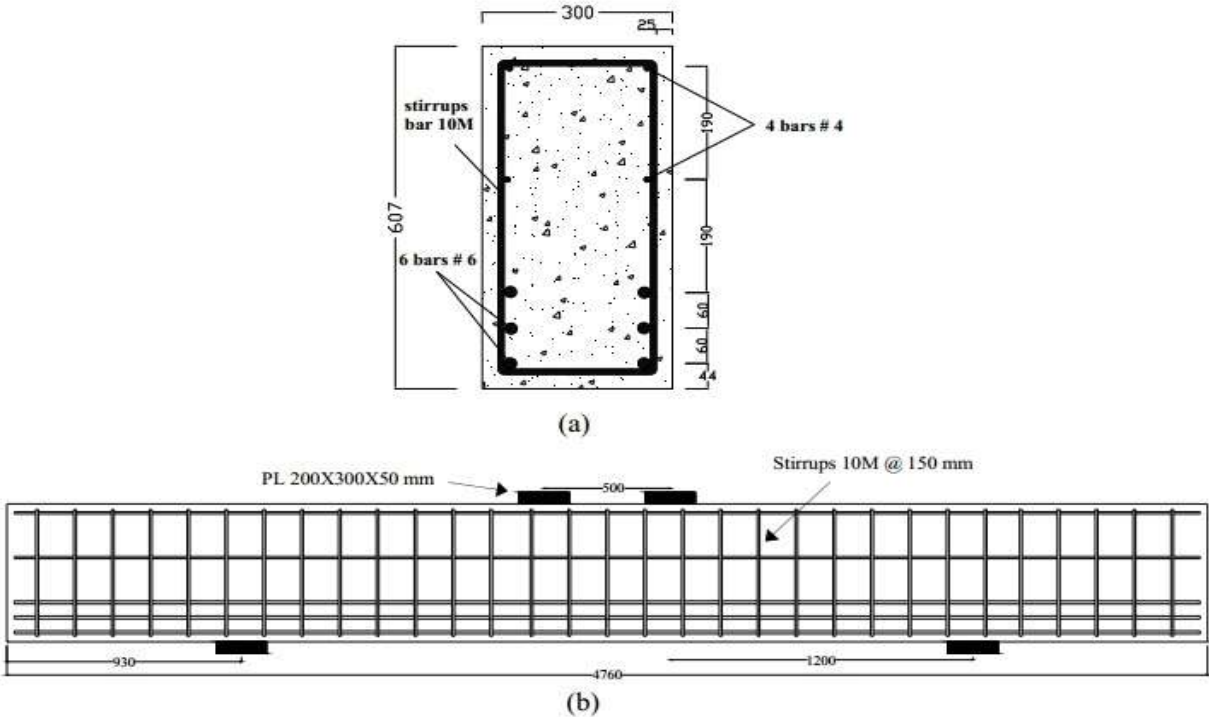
3: Beam MS2-3(a) Cross Section (b) Elevation
